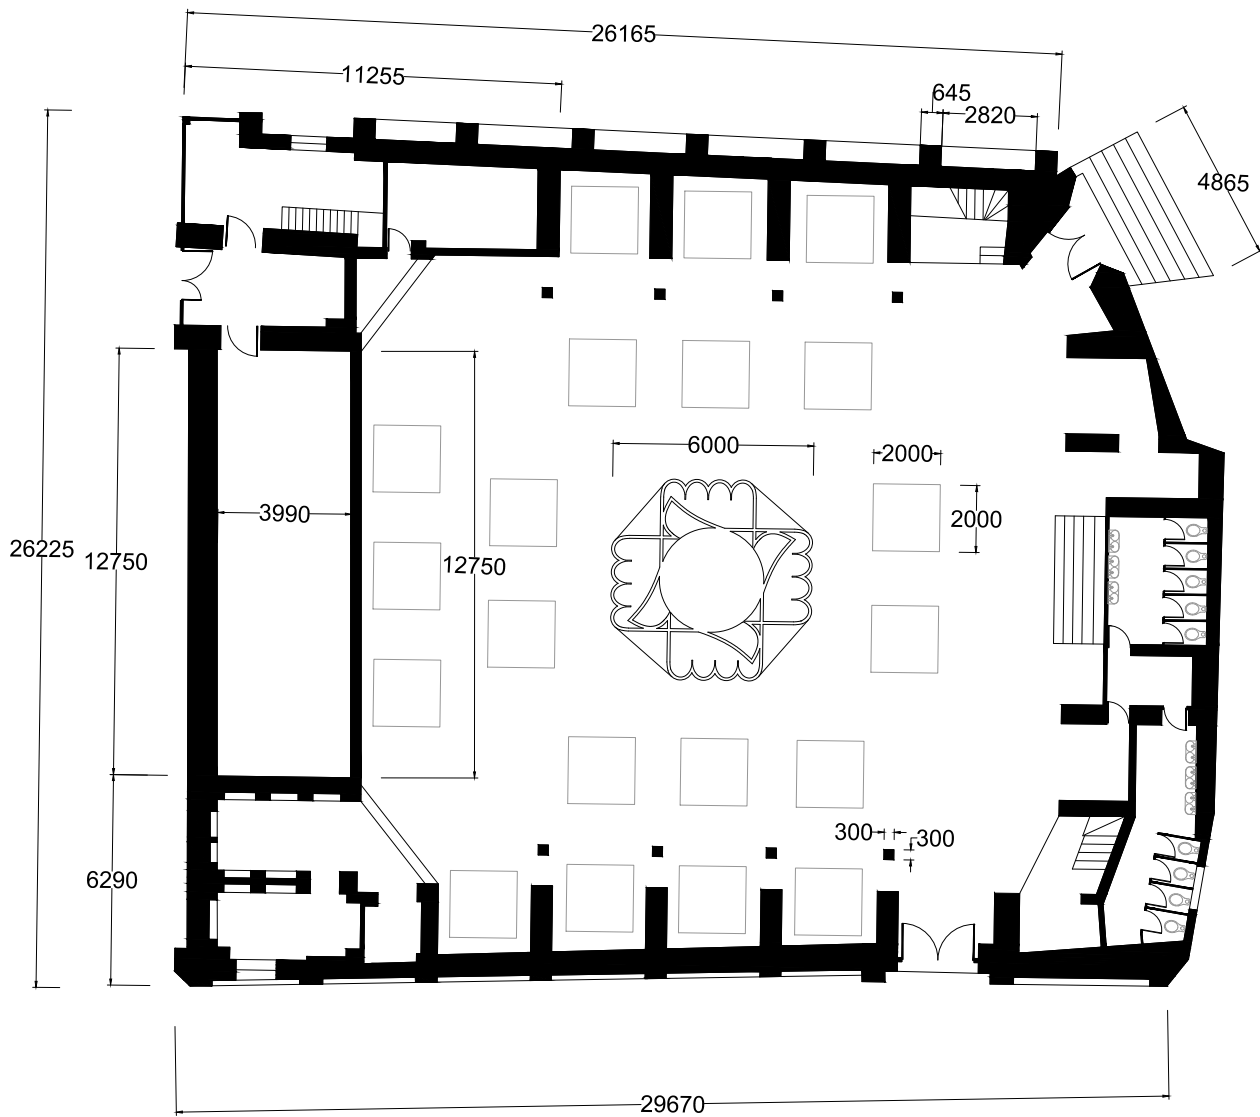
Plan of first floor of building after conversion (with dimensions)
